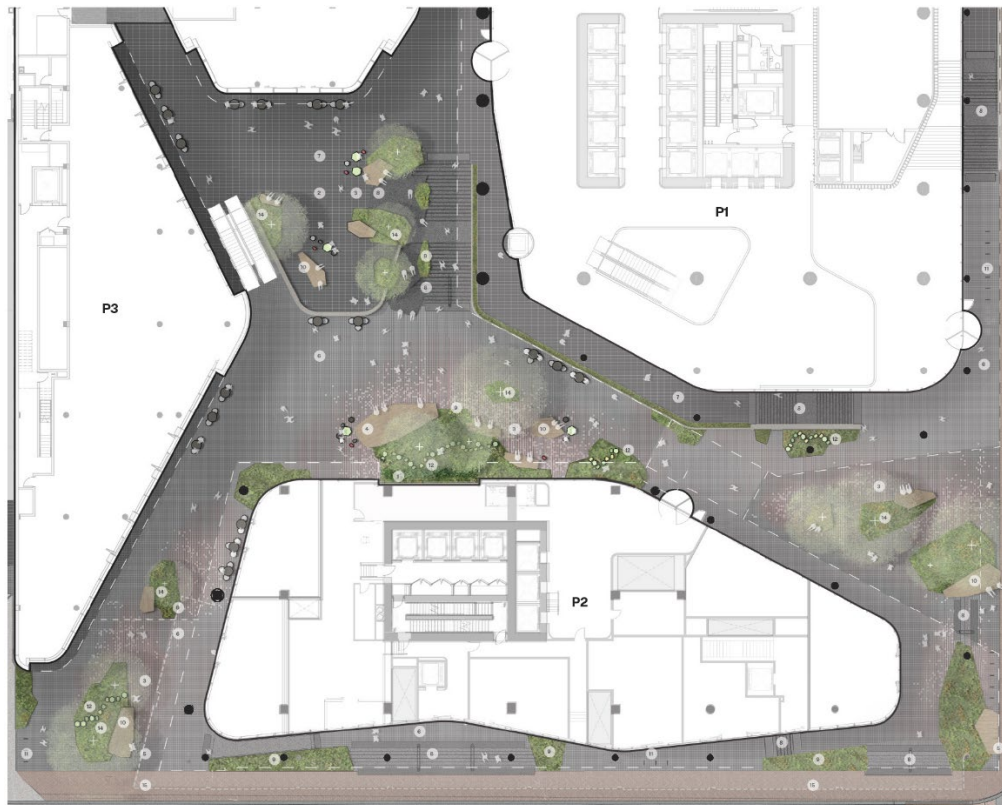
Image F: Indicative Landscape Plan of the Te Urunga Hau (not to scale).
